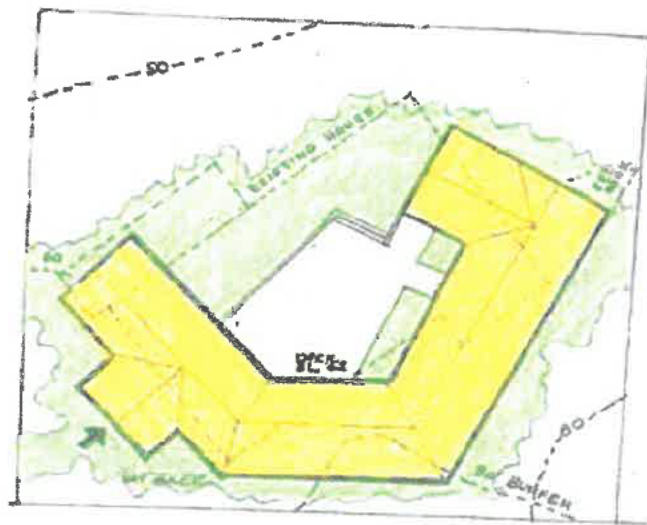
A – Alternative 3 - Reconstruct a new, larger, single-story structure.
